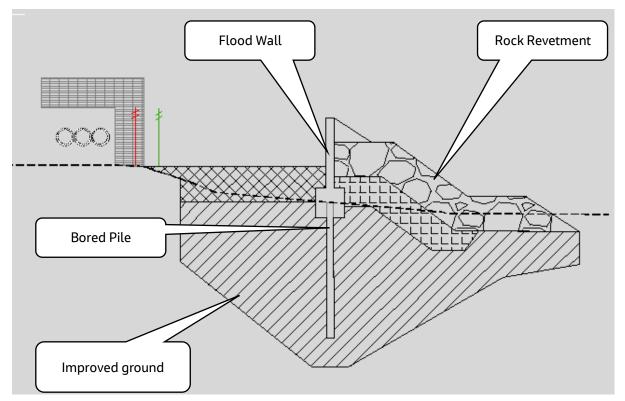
Typical x-section of the ground improvement work with flood wall and rock revetment
